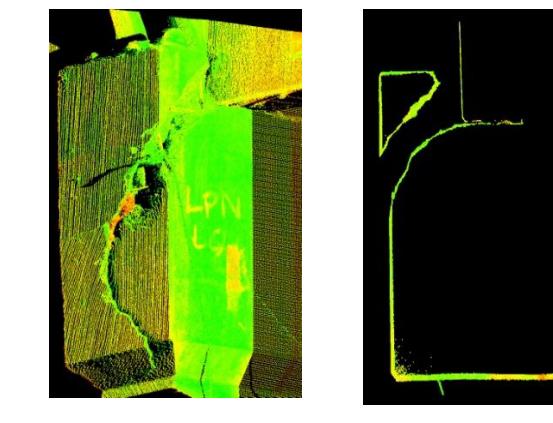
Station 2: Shear key's face (a) next to cross section of key's face (b).
